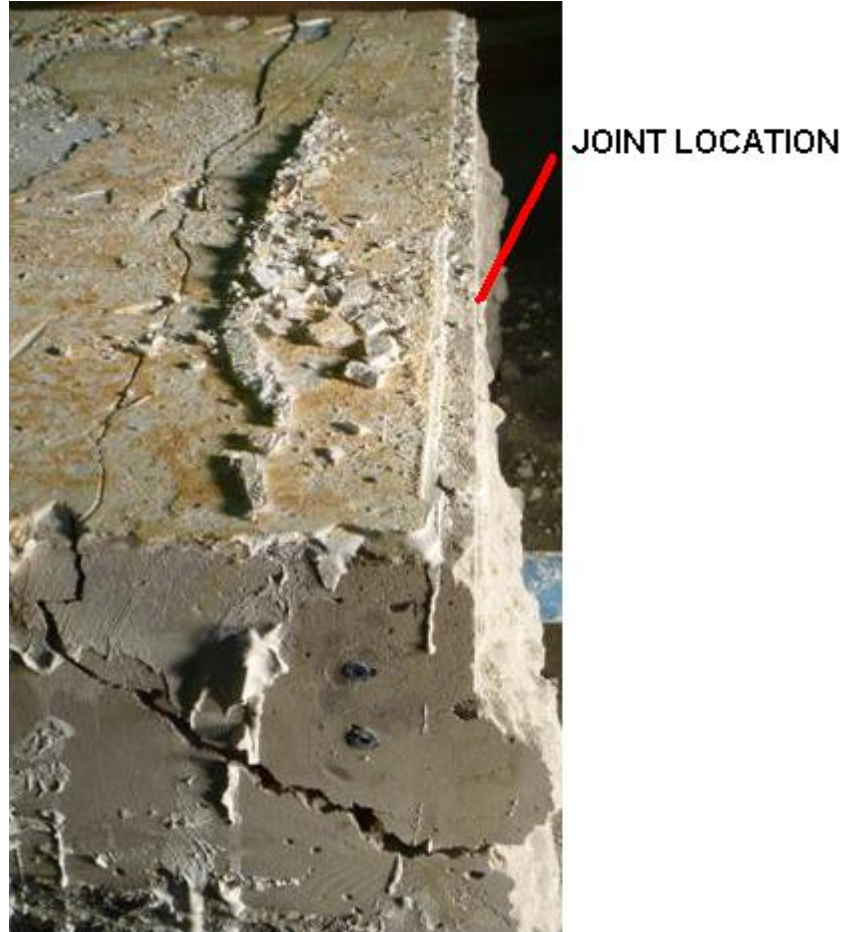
Top Side of Slab Crack Extending from Joint
